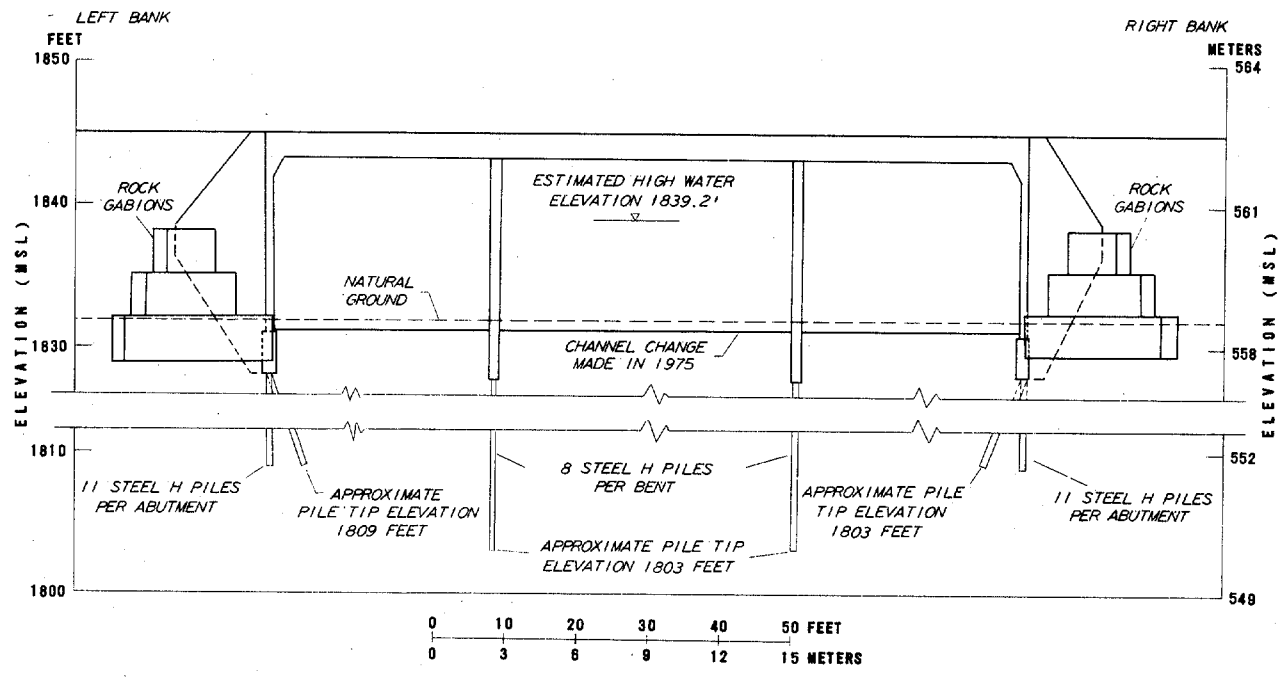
Section at downstream side of bridge, Forest Service road at Salmon Creek.
